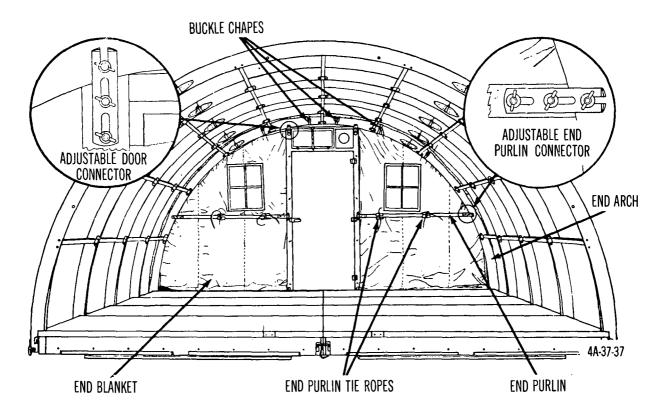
Attaching end blanket to frame of tent, frame-type, insulated, sectional (inside view).
